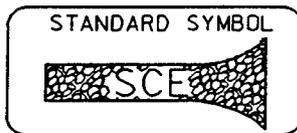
STABILIZED CONSTRUCTION ENTRANCE
